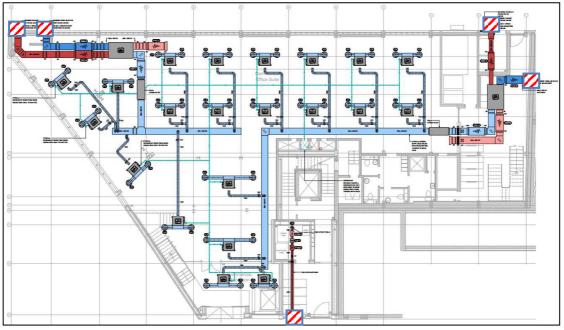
Proposed plant unit installation – Ground Floor (Image Source: QuinnRoss)
